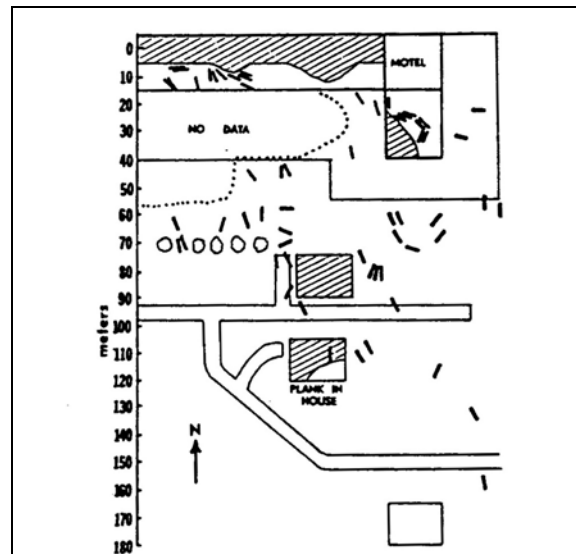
Locations of concrete roof planks with respect to the Regal 8 Motel. The tornado traveled from northwest to southeast. Hatched areas indicate the locations of missing roof planks.
